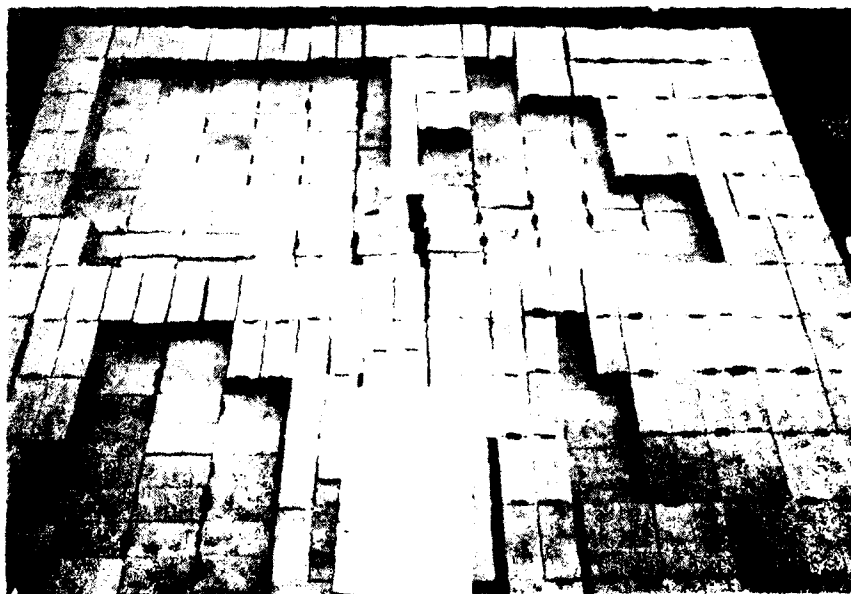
Load at 42 Pallets of Block, 141,200 lb
